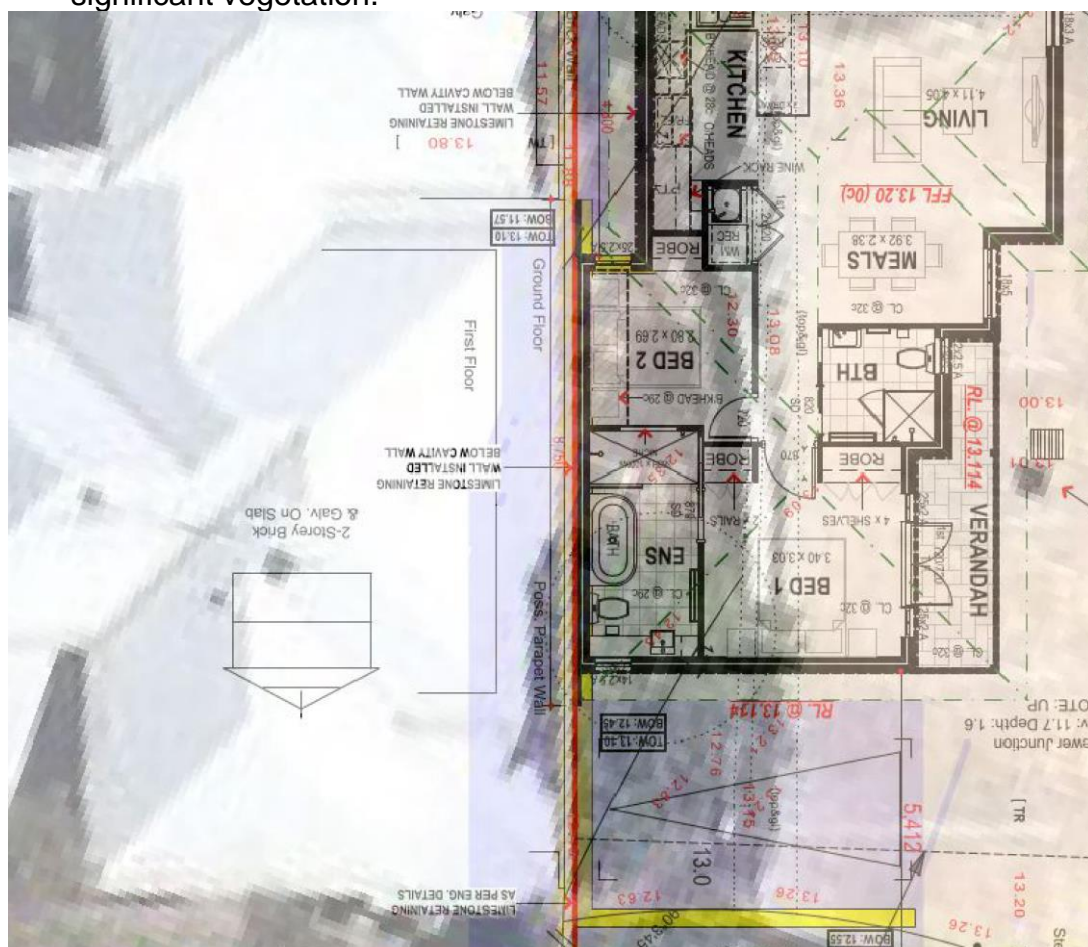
Location of boundary wall (note it abuts a section of neighbouring boundary wall)
